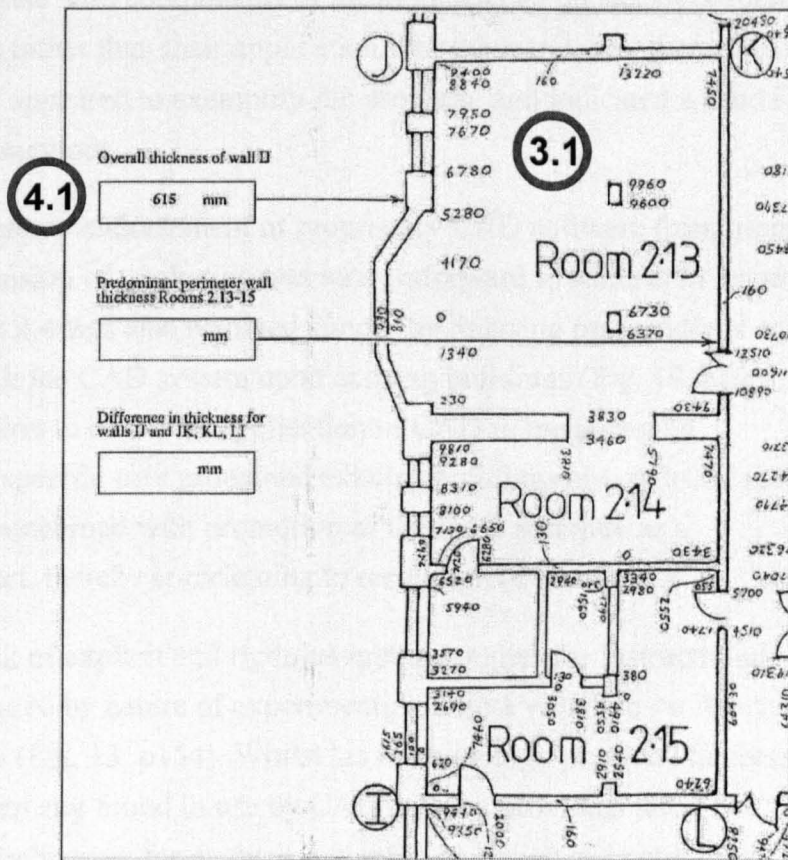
De Montfort University, Clephan Building, Second floor, (detail)
